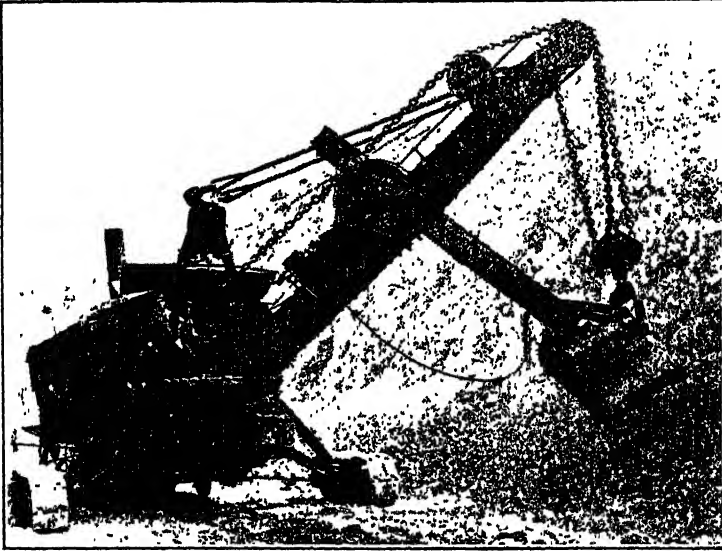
STEAM SHOVEL, CATERPILLAR TRACTION.
